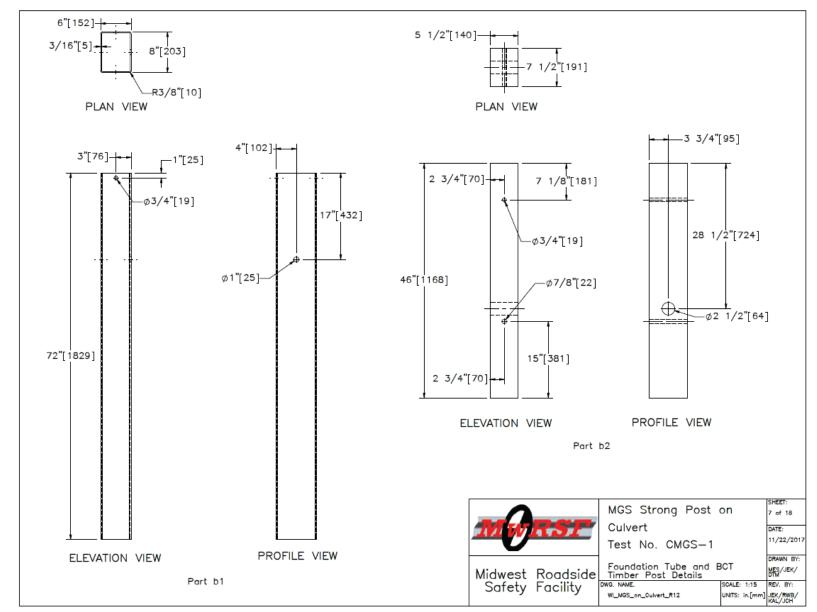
Foundation Tube and BCT Timber Post Details, Test Nos. CMGS-1 and CMGS-2
